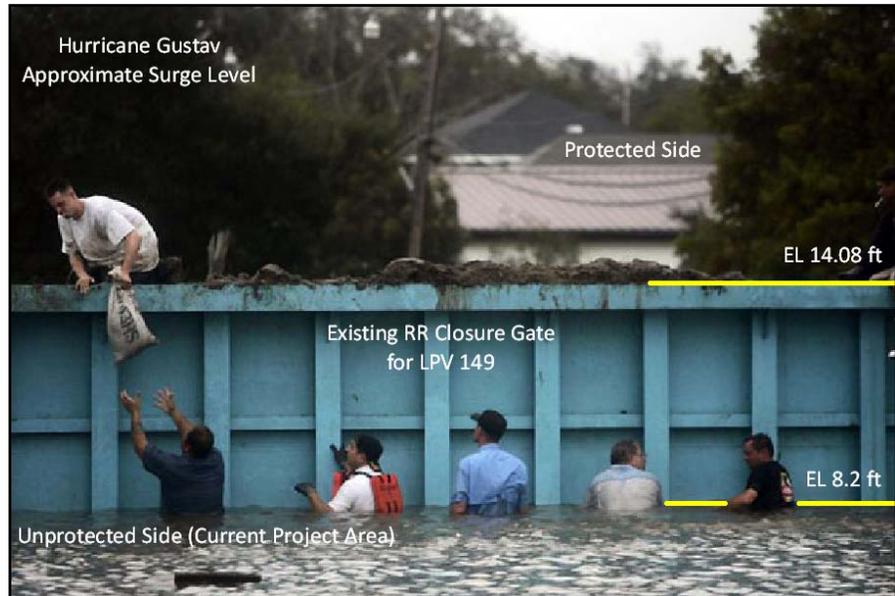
Surge Elevation in LPV 149 from Hurricane Gustav
